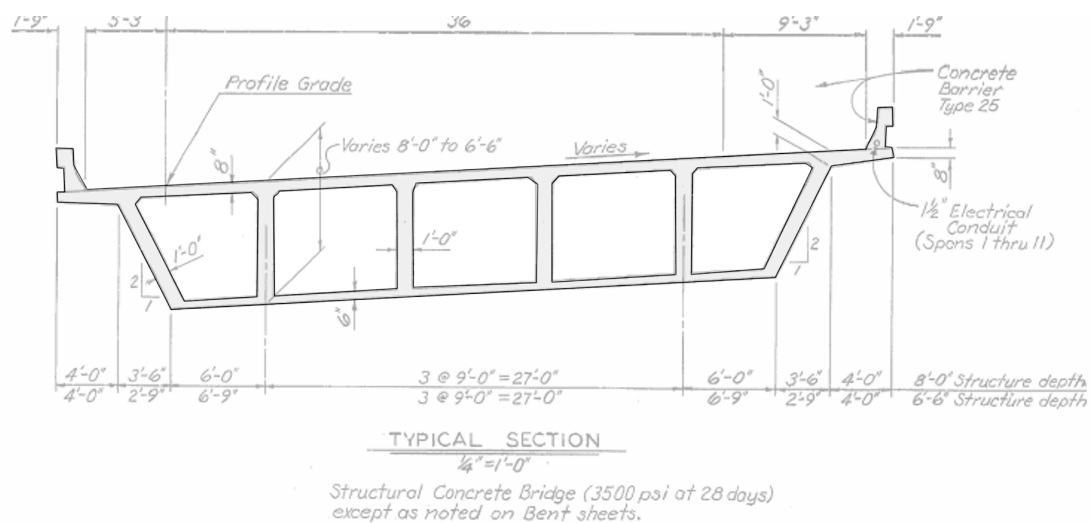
Hayward Bridge typical superstructure girder cross section.
